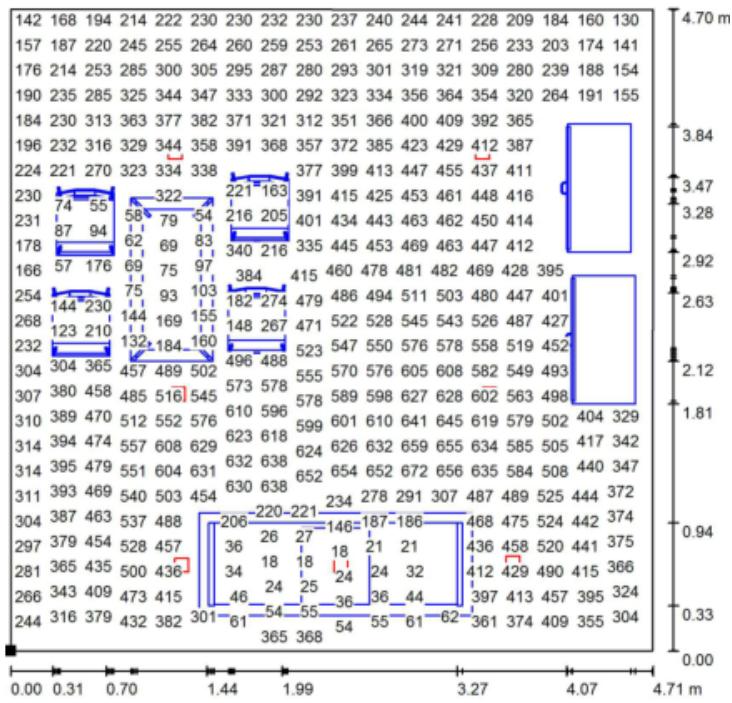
Initial Draft Floor Plan Lighting Test Lux Output
